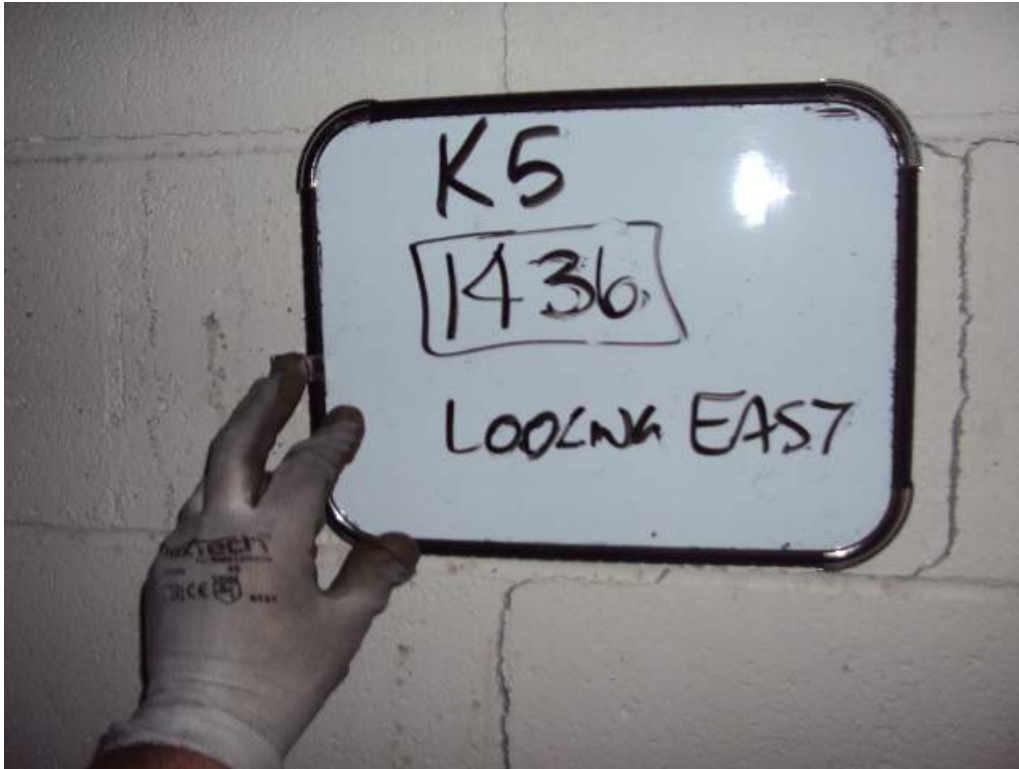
1st Floor – Room 1436– At col line K5 – Looking East– Stair step crack in CMU wall
